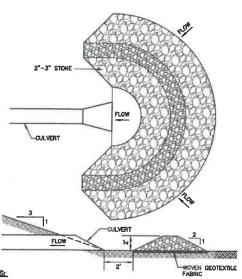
DETAIL SHEET WADLEIGH ROAD APARTMENTS SHEET 23 OF 27 JBE PROJECT NO. 21137
